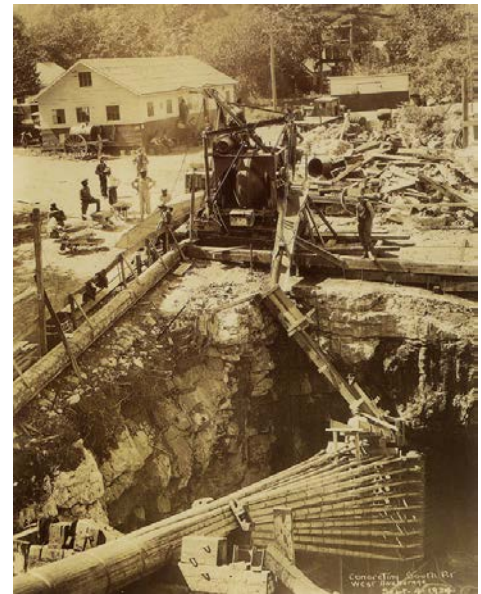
Photograph showing concreting of west anchorage. From "Bear Mountain Bridge – The History," by The New York State Bridge Authority.
